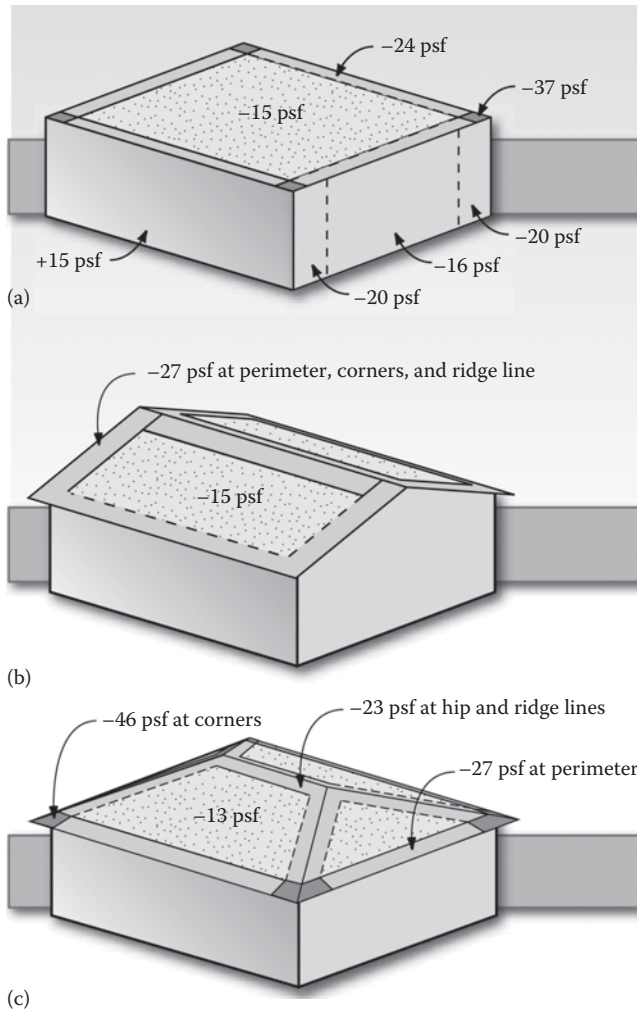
Relative roof uplift pressures as a function of roof geometry, roof slope, and location on roof, and relative positive and negative wall pressures as a function of location along the wall: (a) flat or gable, up to 7° roof slope, no overhang, and (b) gable, 27°–45° roof slope, overhang all sides. (c) Hip or gable roof, 7° to 7° roof slope, overhang all sides. *Note:* Design pressures all assume an enclosed building with the same basic wind speed of 90 mph, Exposure B, and 30 ft roof height. (From FEMA 424. *Design Guide for Improving School Safety in Earthquakes, Floods, and High Winds*. Washington, DC: Federal Emergency Management Association, January 2004.)
